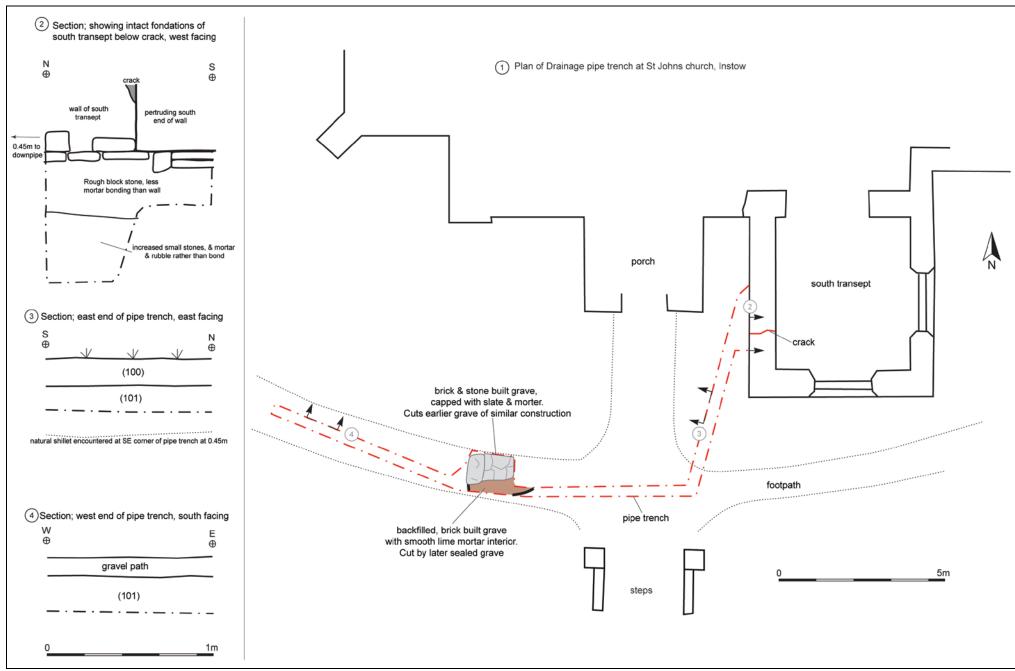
Site drawings; Plan and sections. Section drawing numbers (2-4) correspond to grey-scale numbers on plan (1).
